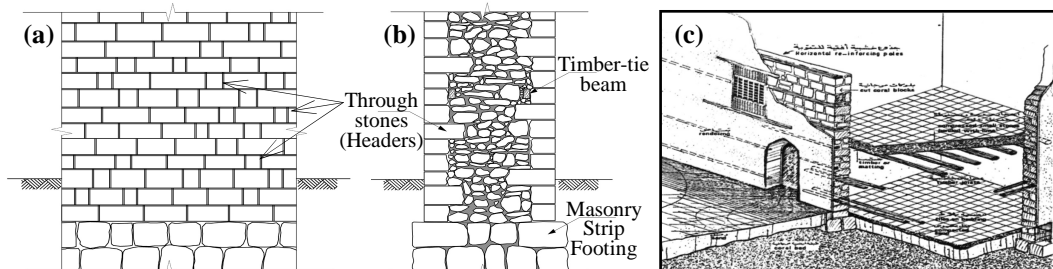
Typical details of multiple-leaf masonry walls in archaeological Islamic buildings in Cairo: a) Elevation view of wall's façade, b) Cross-section view of the wall showing its three leaves, c) 3D-view⁵⁰ of a masonry building showing timber tie-beams
